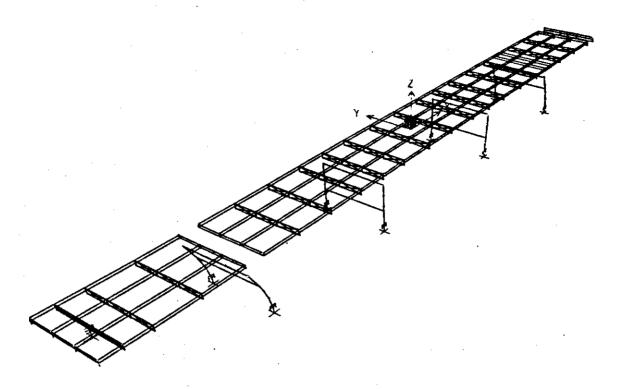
Mode 2, Period 0.3518 Seconds (Old Wahite Ditch Bridge)
